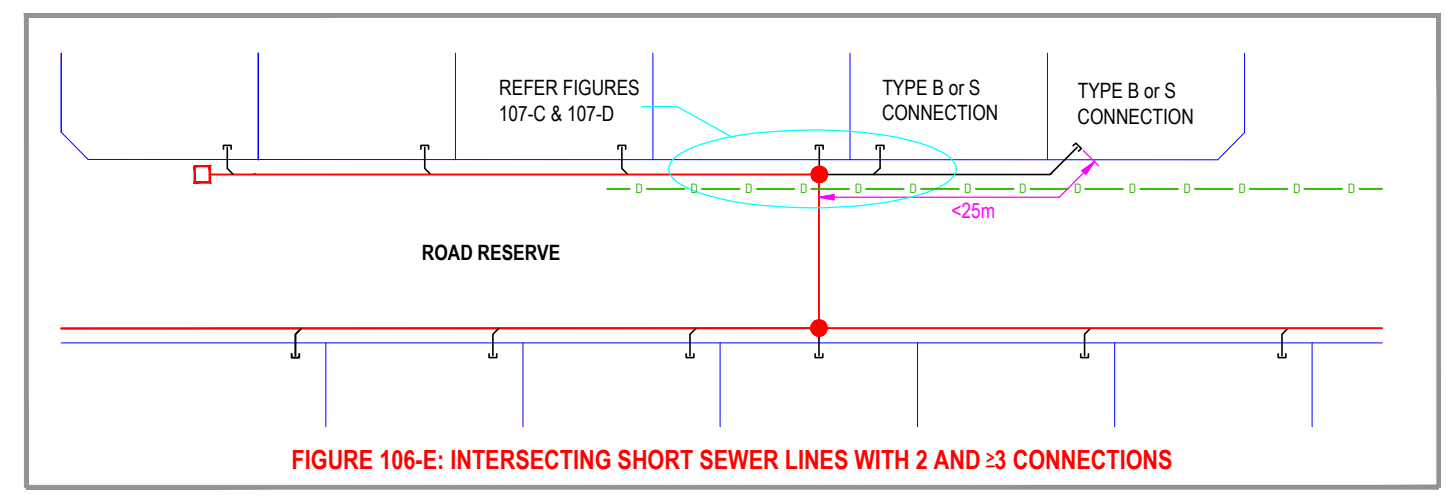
E: INTERSECTING SHORT SEWER LINES WITH 2 AND ≥3 CONNECTIONS
